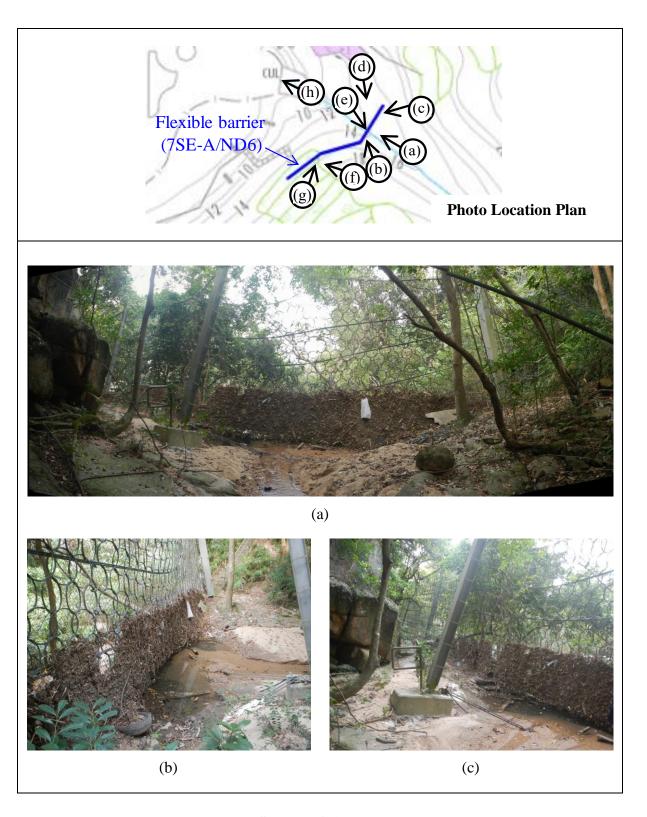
Site Inspection Photos (Sheet 1 of 2)
